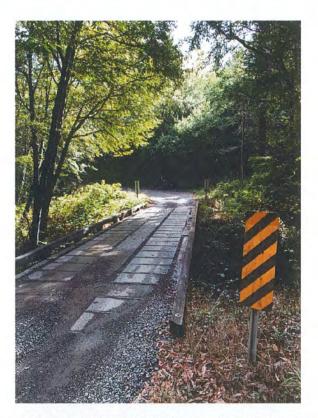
RP 4. Single-Lane Bridge. Vehicle traveling east (parked in large turnout east of bridge), photo taken facing east.
